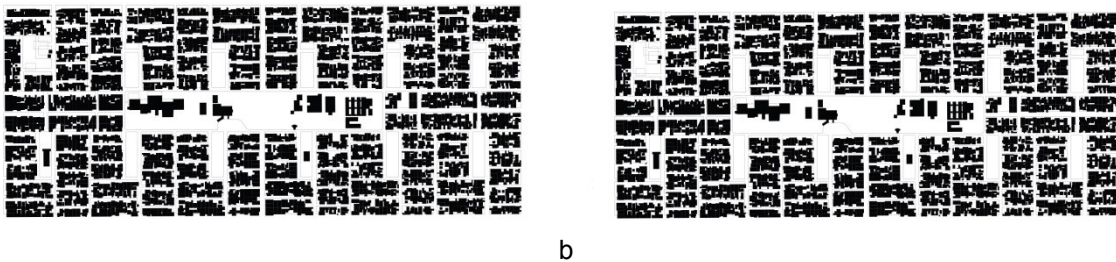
a original plan, 1966, b actual plan, 2014
